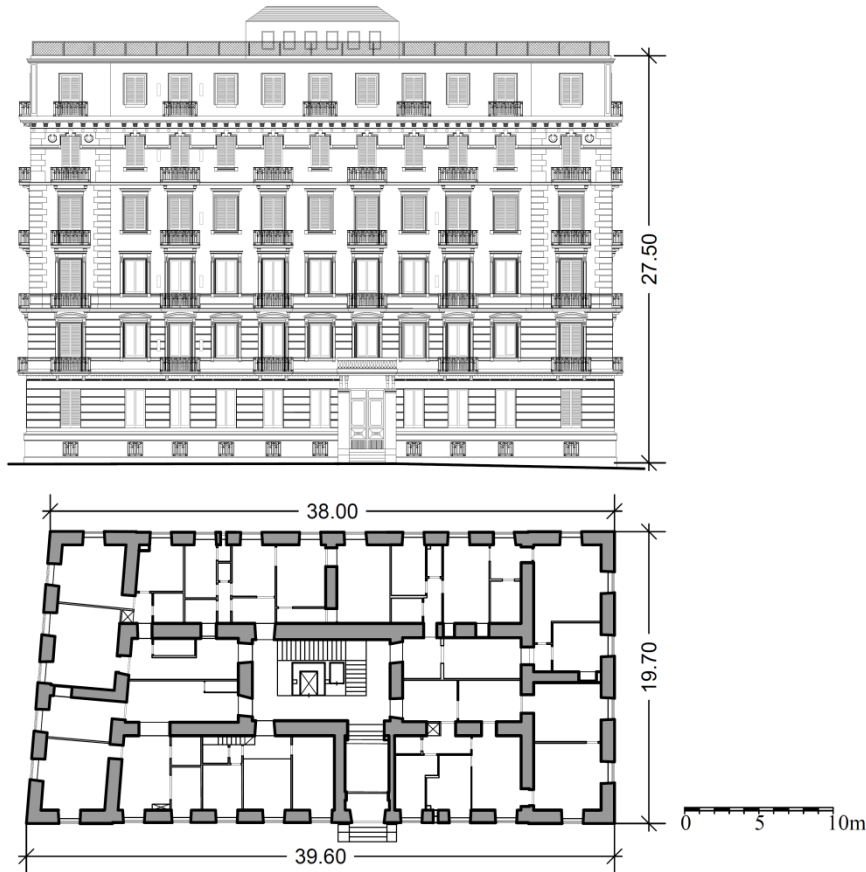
Palazzo Scarpa*: frontal view and plan of the first floor
